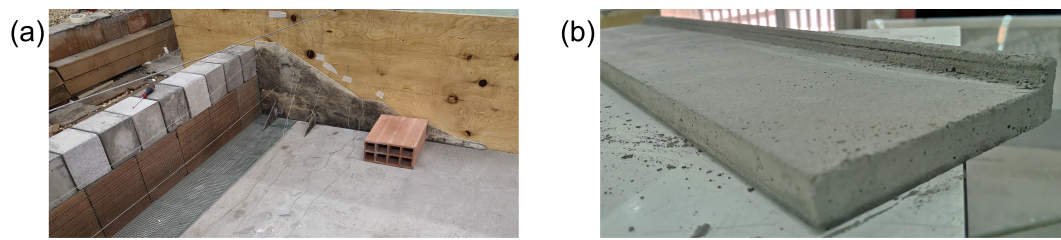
Construction of the physical model: (a) impermeable wall as back support of the rubble mound structure; (b) specially designed concrete wave wall.
